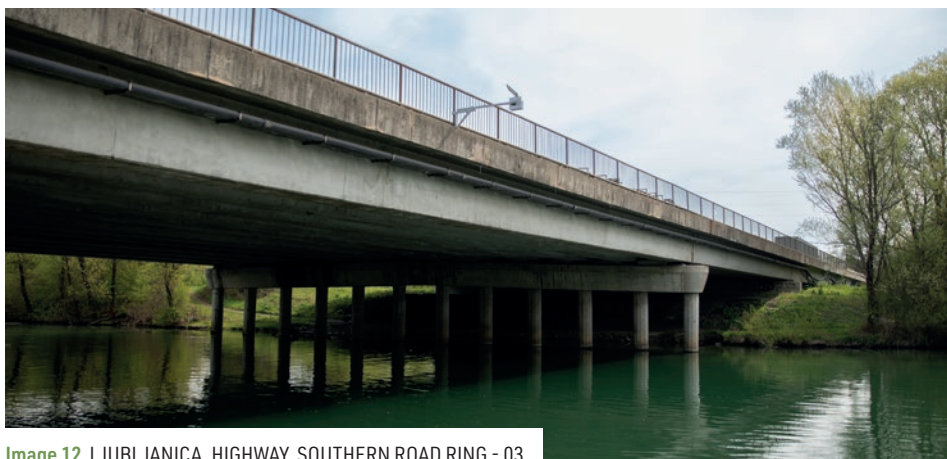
LJUBLJANICA, HIGHWAY, SOUTHERN ROAD RING - 03
